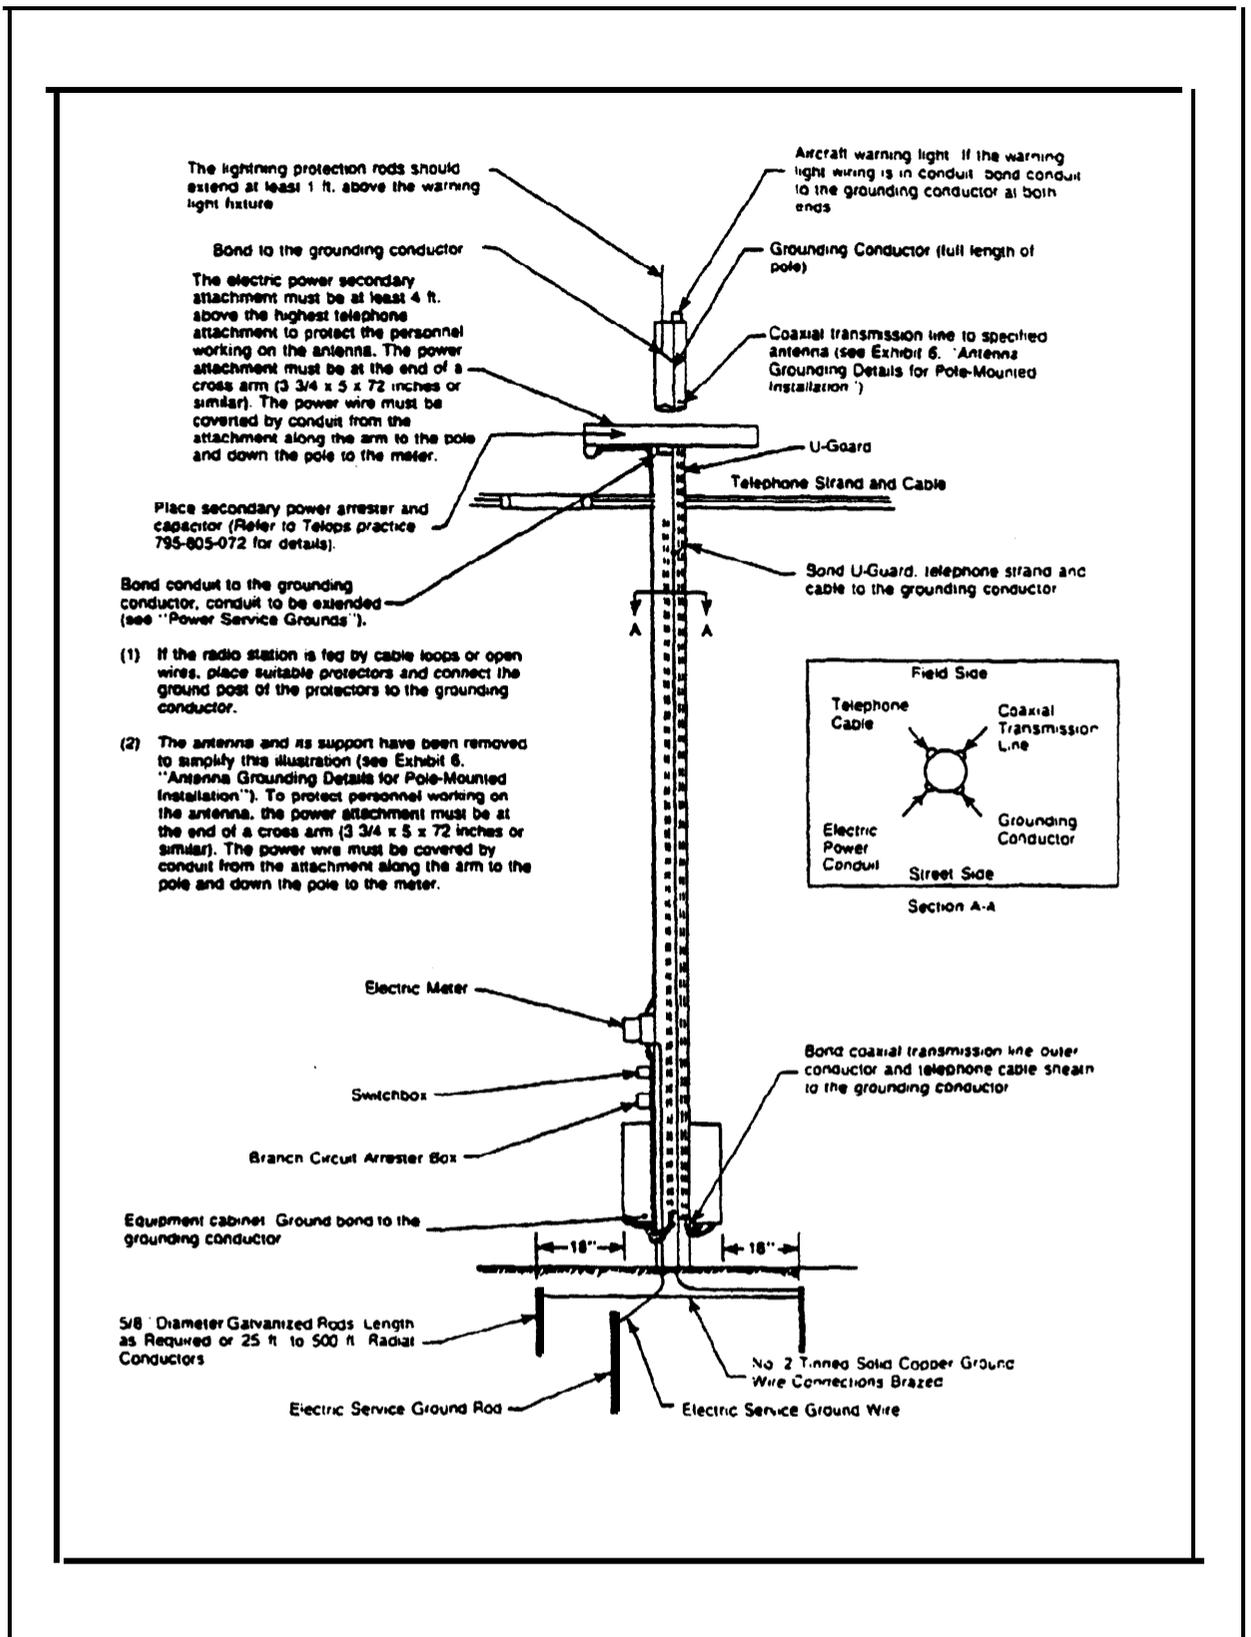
Standard Grounding Arrangement - Typical Pole-Mounted Installation
